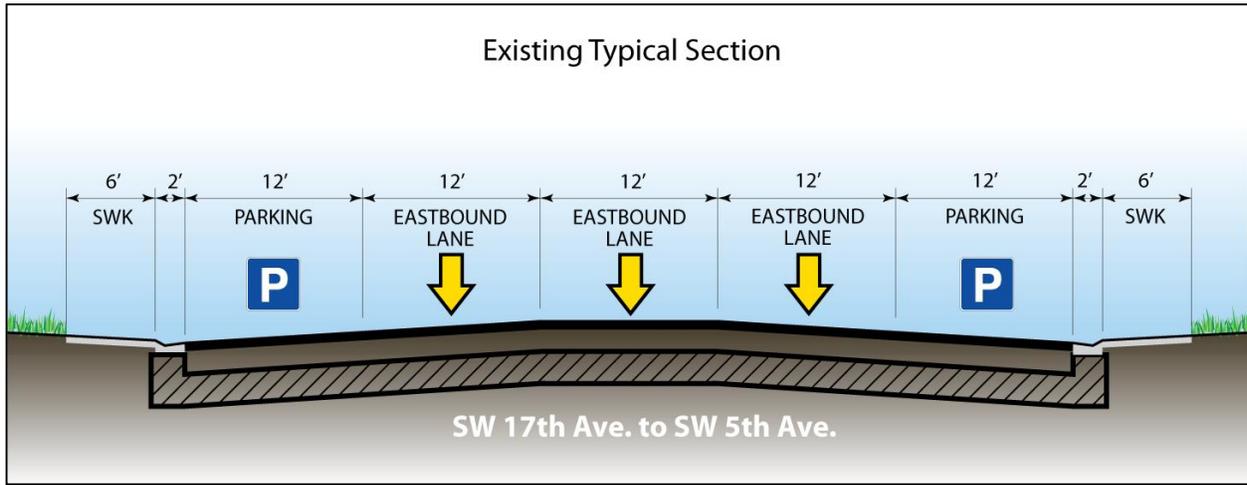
Typical SW 1<sup>st</sup> Street Lane Configuration – SW 17th Avenue to SW 5th Avenue
